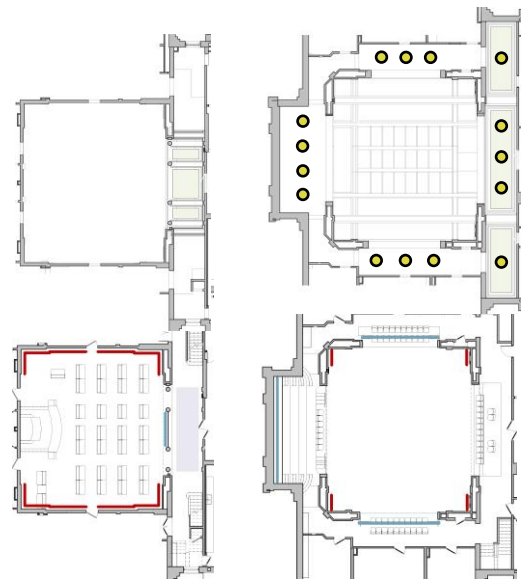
d - Senate Chamber Floor Plans and Reflected Ceiling Plans
